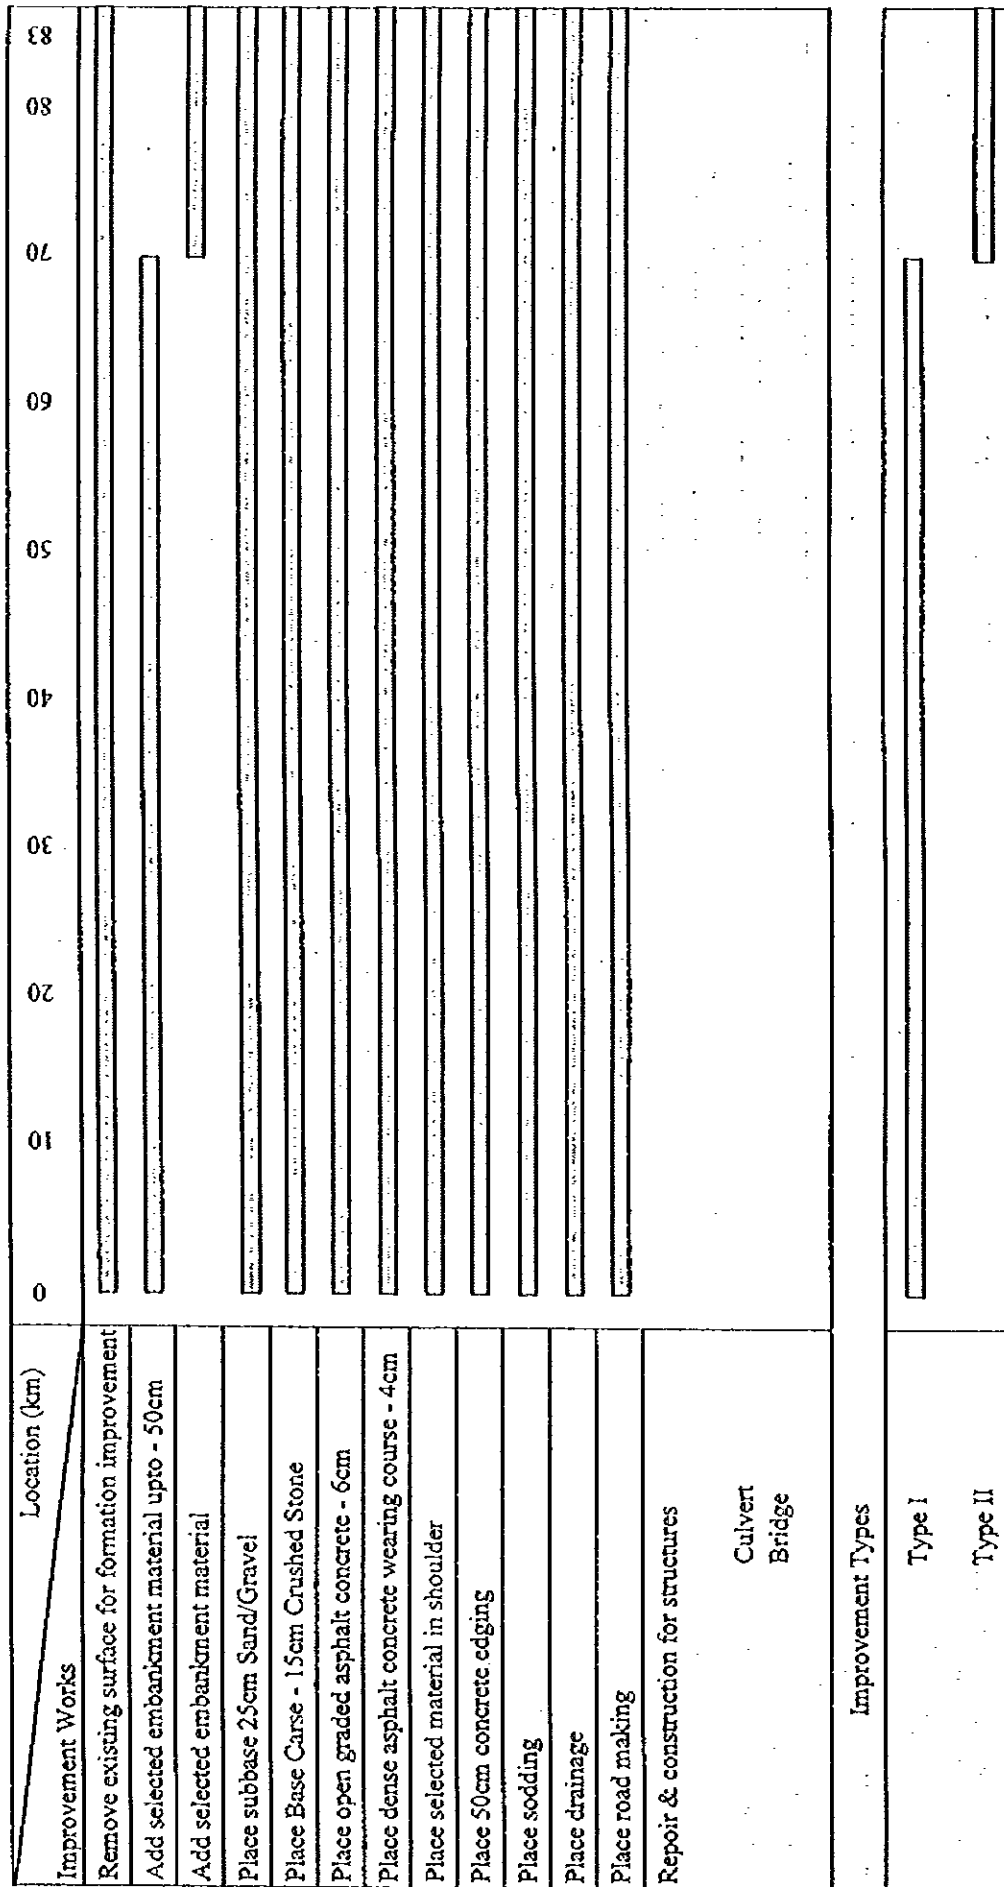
(2) : Road Improvement Plan on the Atyrau ~ Mahambed road section
